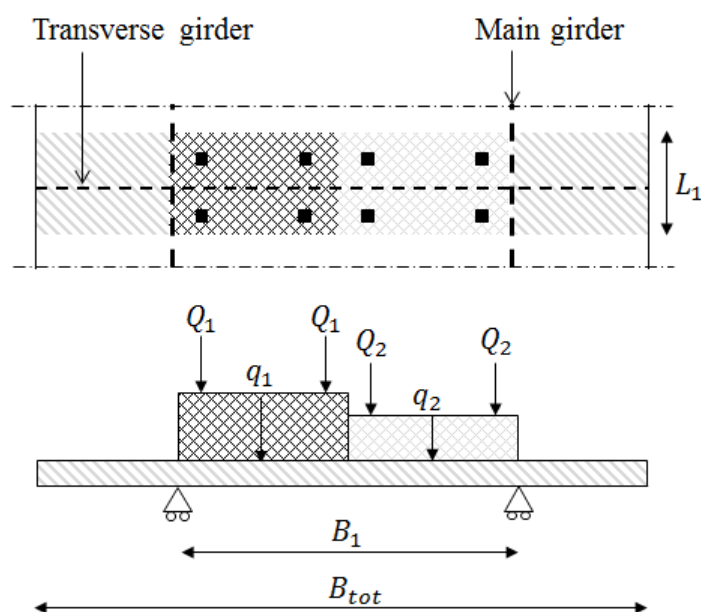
Load case considered for the preliminary design of the transverse girders.
